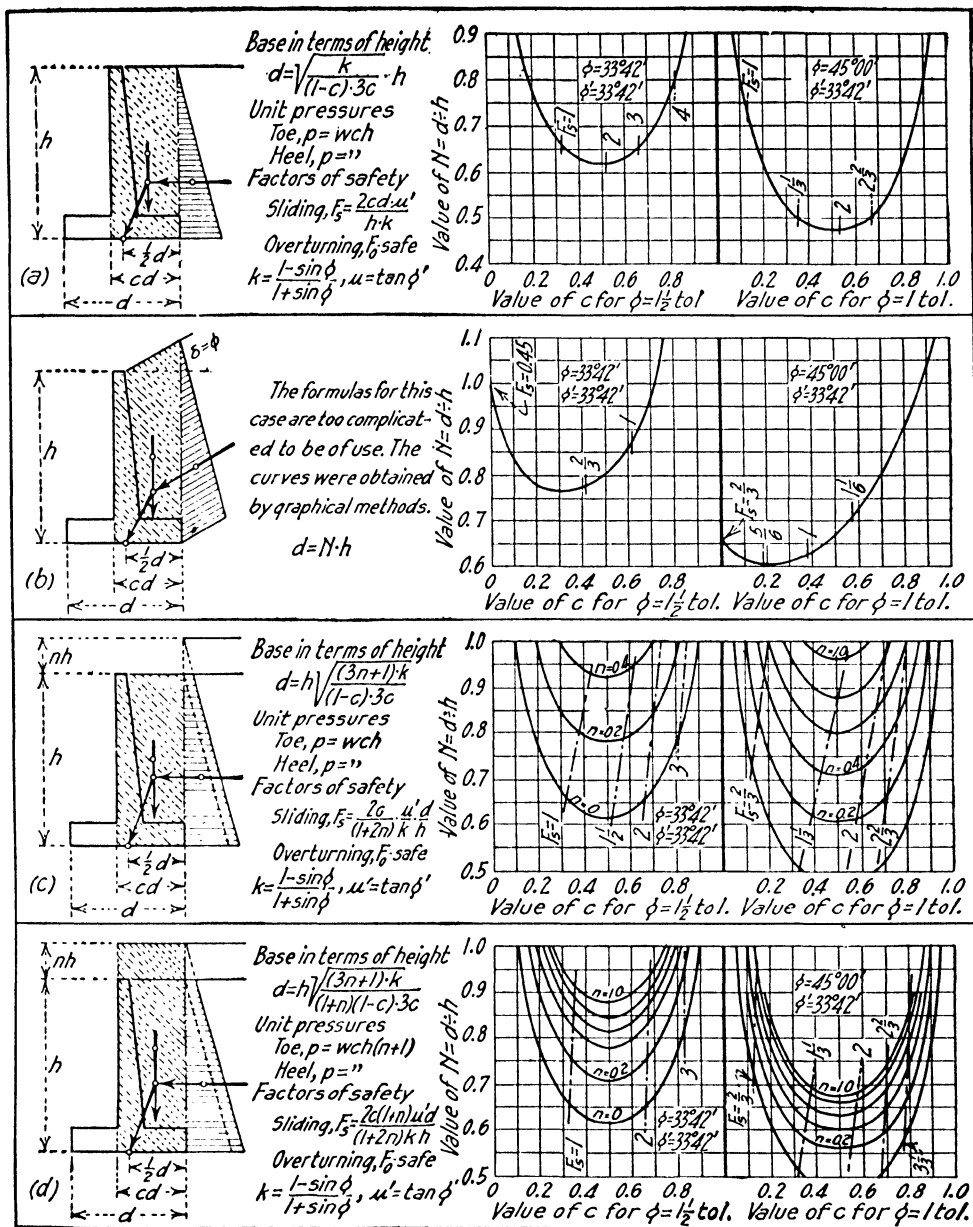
APPROXIMATE DESIGN OF REINFORCED CONCRETE RETAINING WALLS. (Resultant thrust at center of base.)
